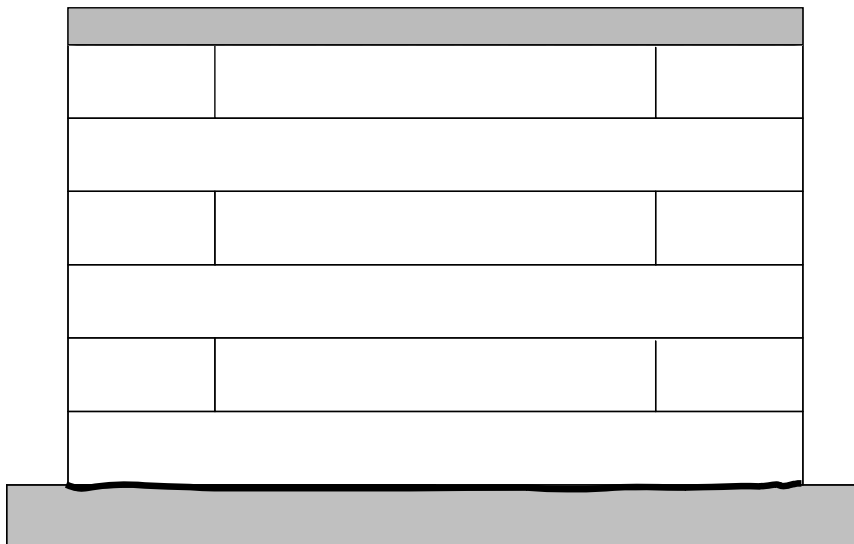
Initial shrinkage crack at base of Shear Wall Pilot Specimen 1
